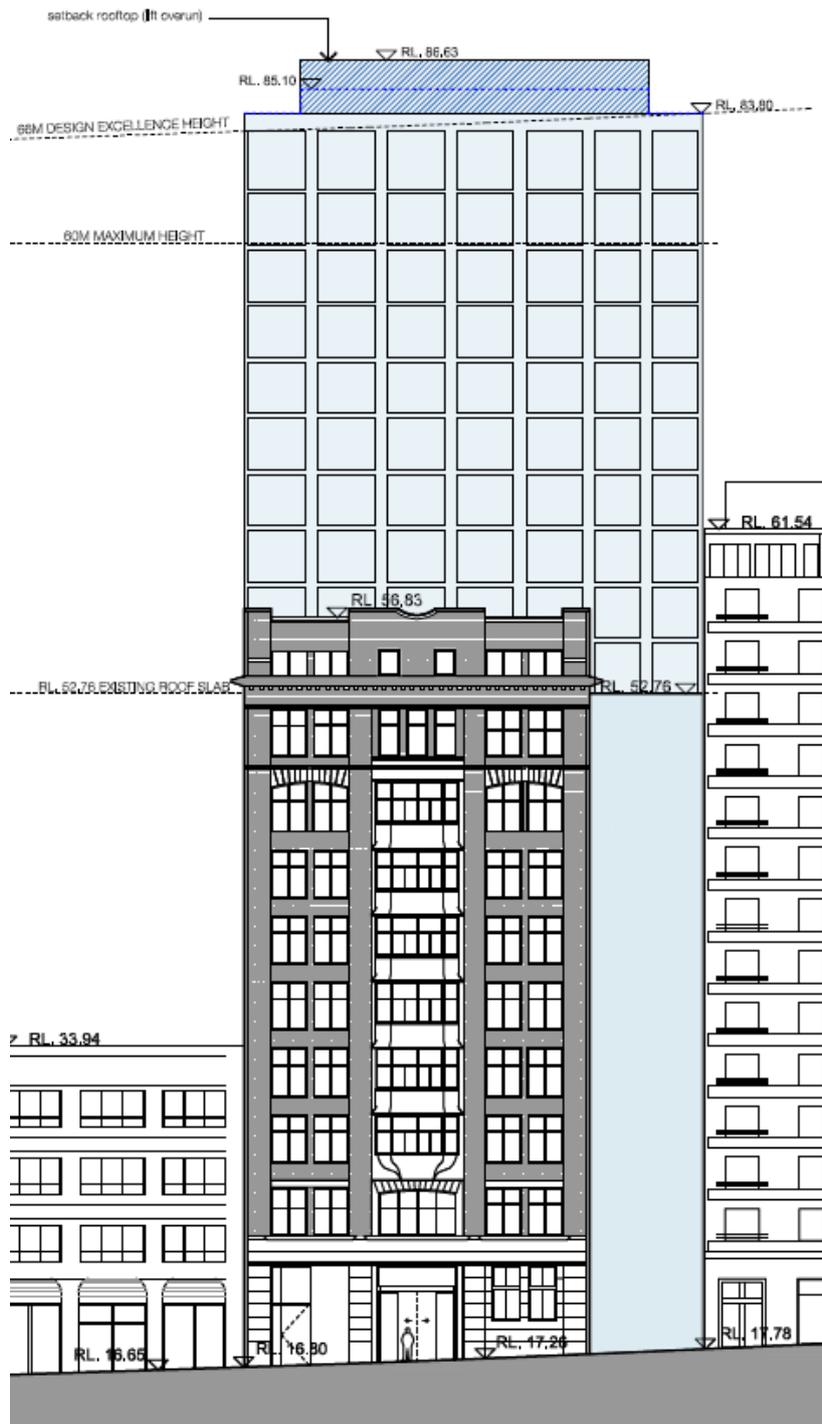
Approved Wentworth Avenue elevation D/2016/1463
